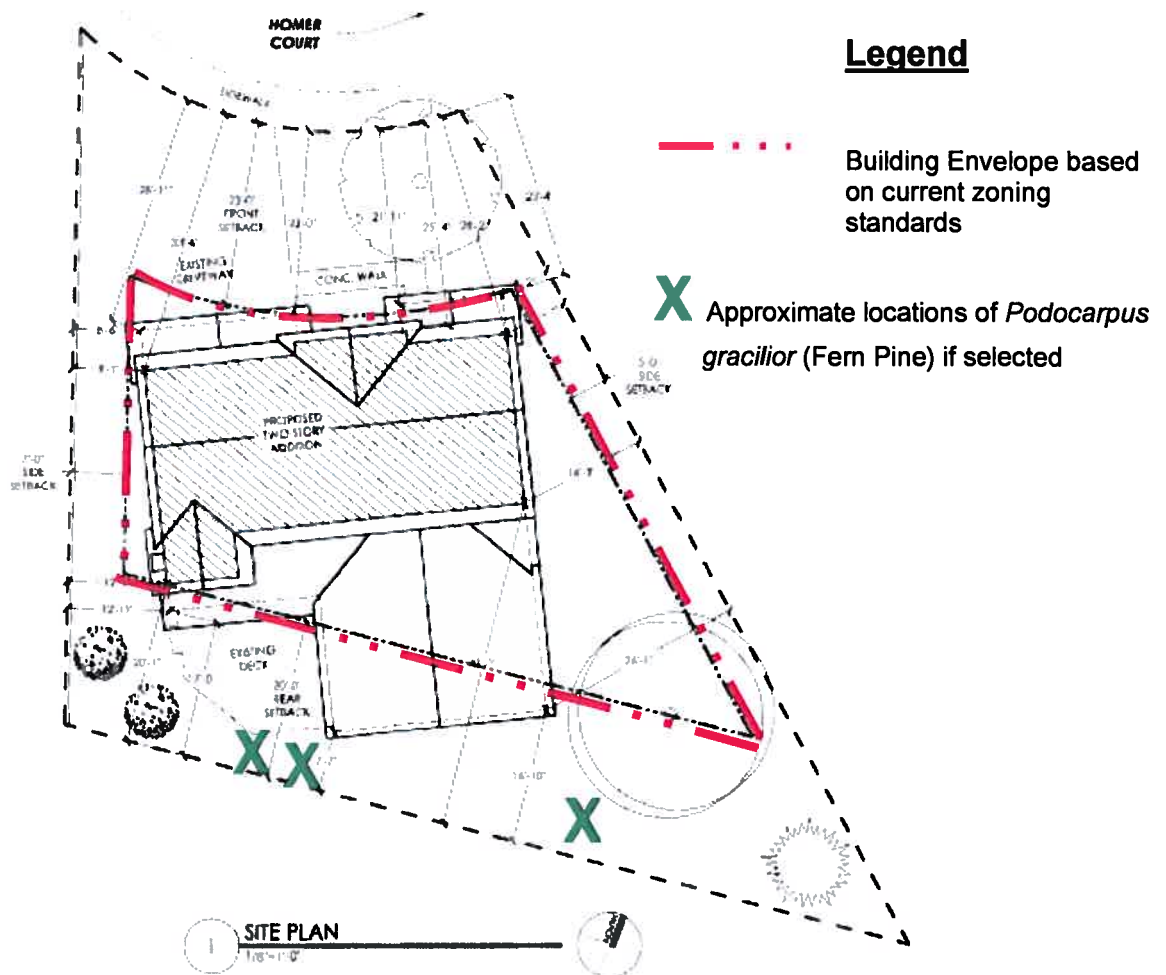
SITE PLAN FOR PROPOSED ADDITION (NOT TO SCALE)
